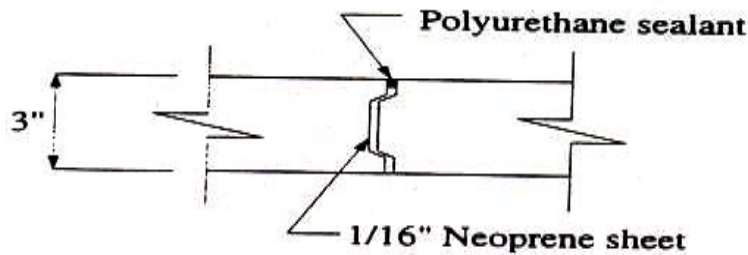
Shear key detail of the Bloomington Bridge
